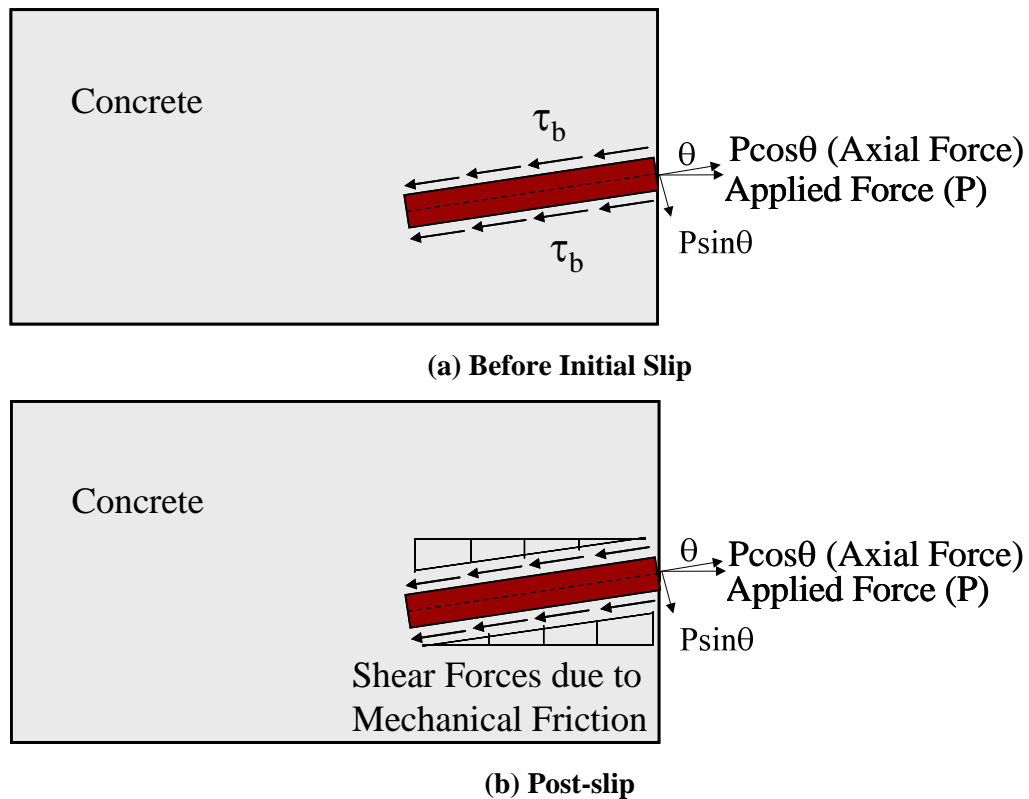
Forces on a misaligned dowel and surrounding concrete
